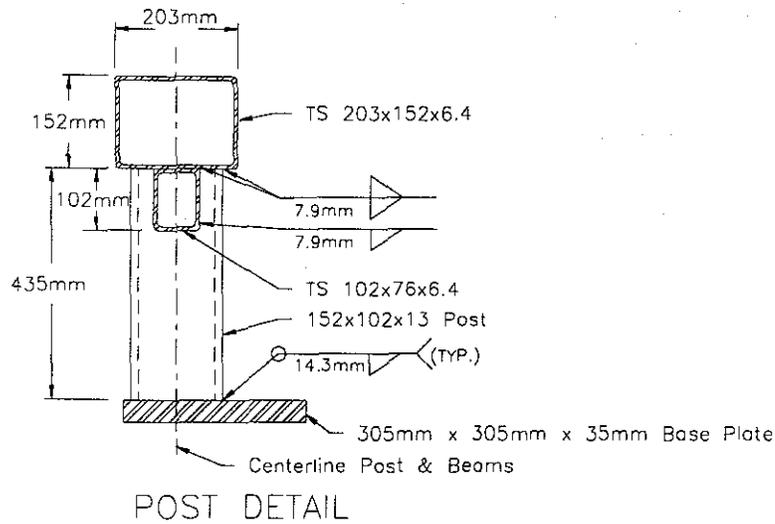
Details of metal bridge railing for Washington, DC, historic bridge rail (continued).
